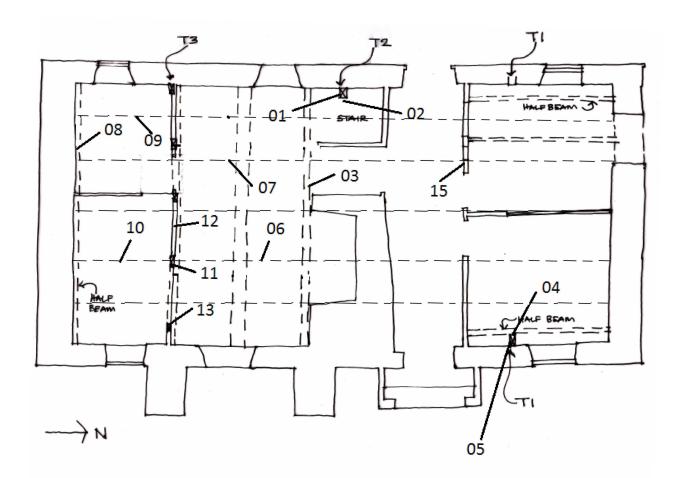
Plan of the farmhouse showing the approximate locations of samples taken for dendrochronology (except sample 14 from a ceiling joist)
